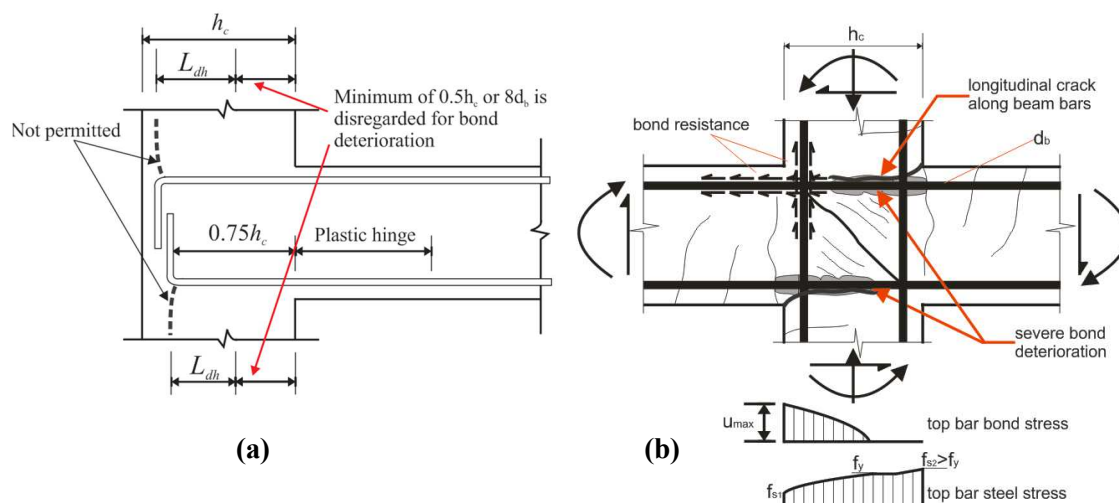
Schematic illustration of the anchorage zones of longitudinal beam bars when plastic hinge zones are permitted at the column face for: (a) exterior beam-column joints (NZS3101:2006); (b) at interior beam-column joints with severe bond deterioration (After Hakuto *et al.*, 1999).
